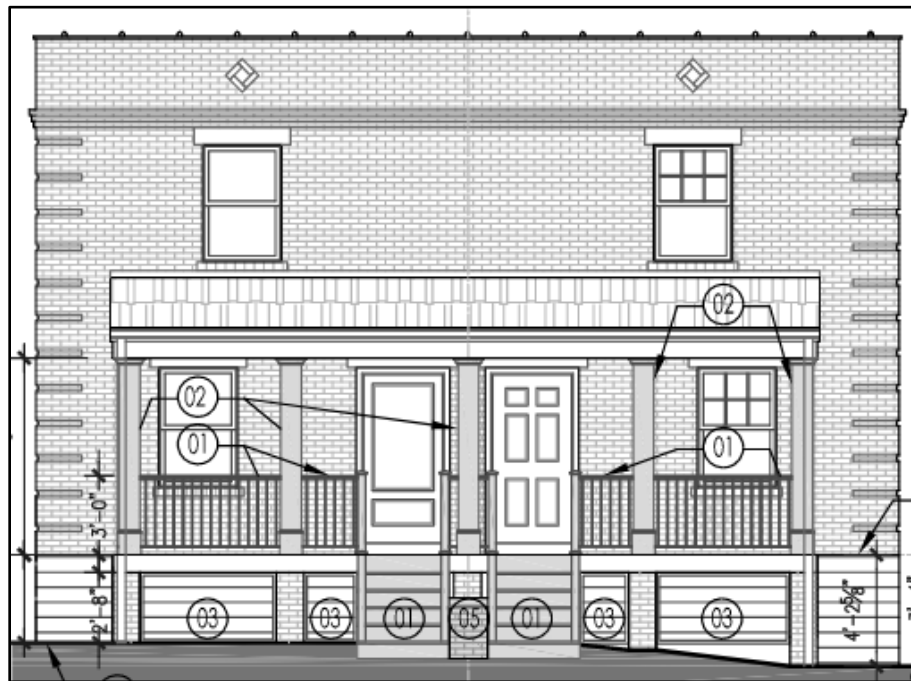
Proposed porch alterations at 1612 & 1614 Princess St.
